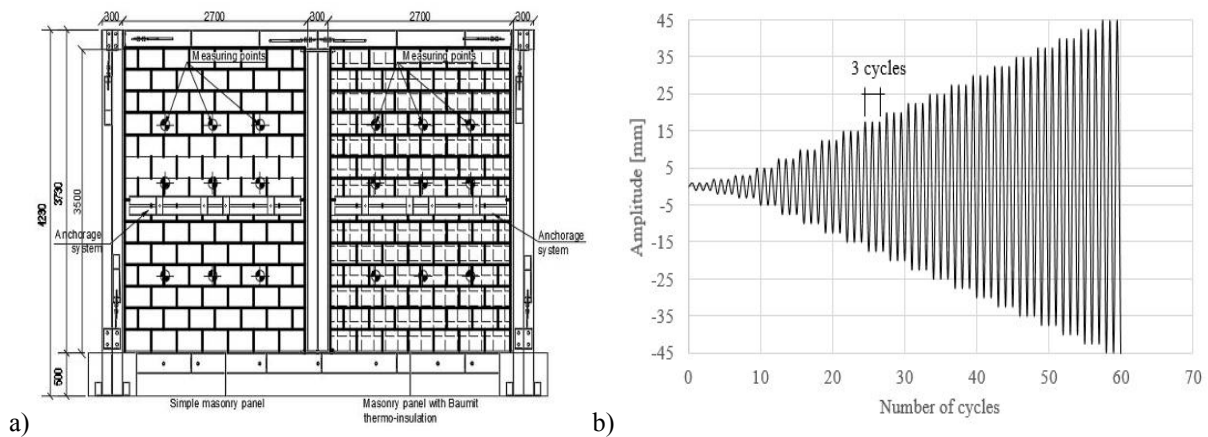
a) Out-of-plane measuring points of infill panels; b) Loading protocol
